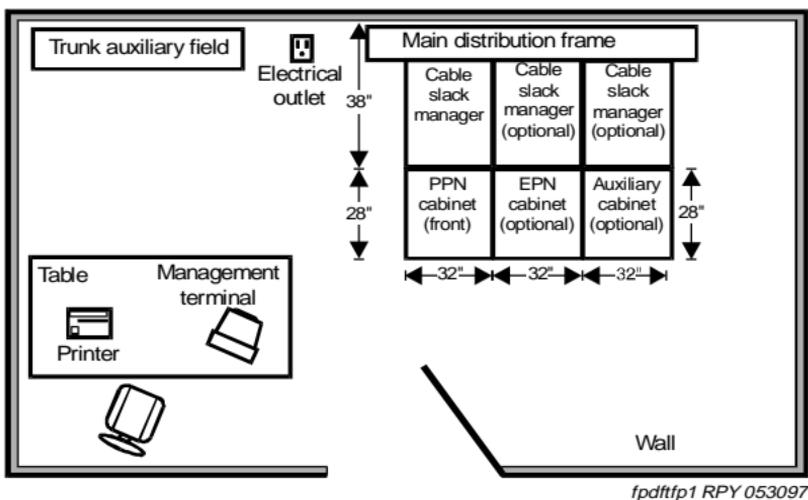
Typical Floor Plan with EPN and Auxiliary Cabinet
